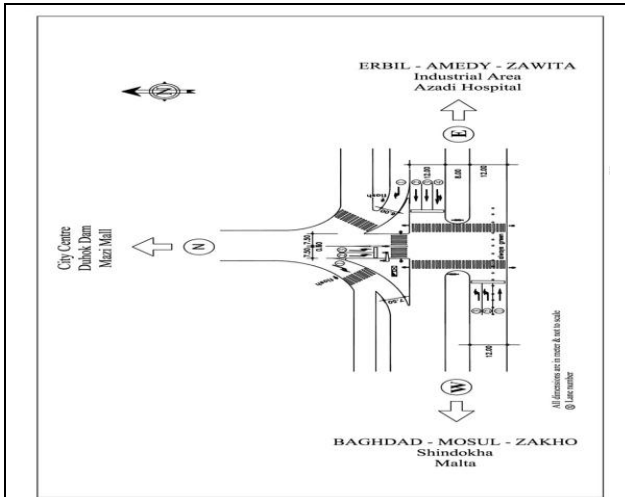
Sarok Intersection (SK) Plan (Directorate of Traffic, Traffic Engineering Department, Duhok City, 2009)
